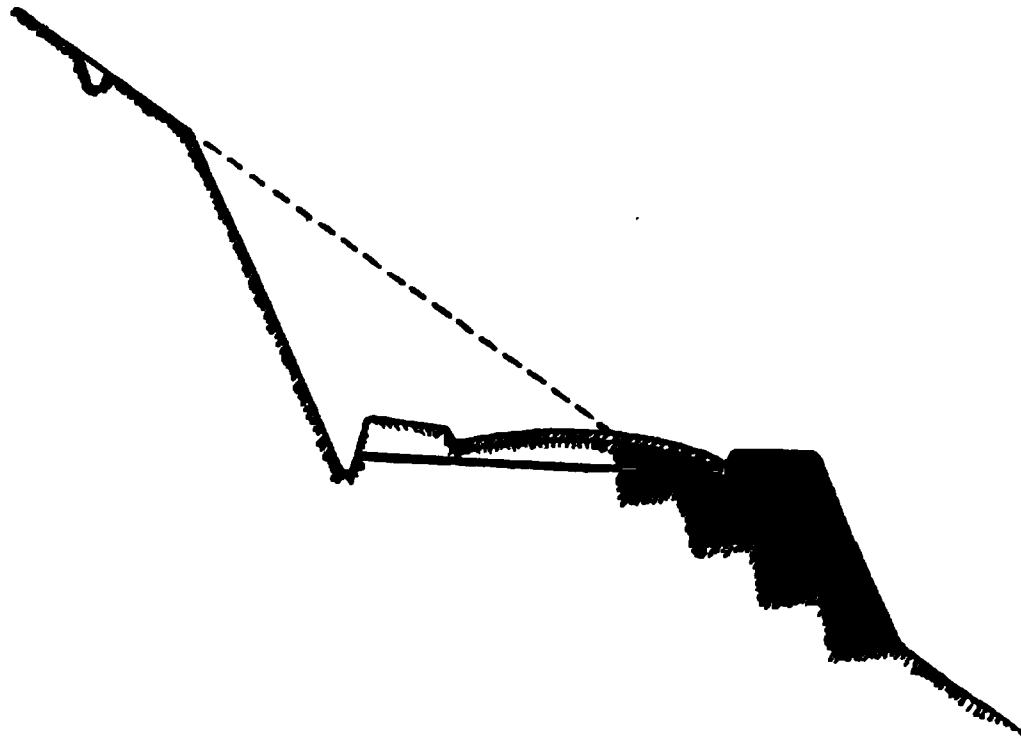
Method of Construction on Slopes by Stepped Embankment.
